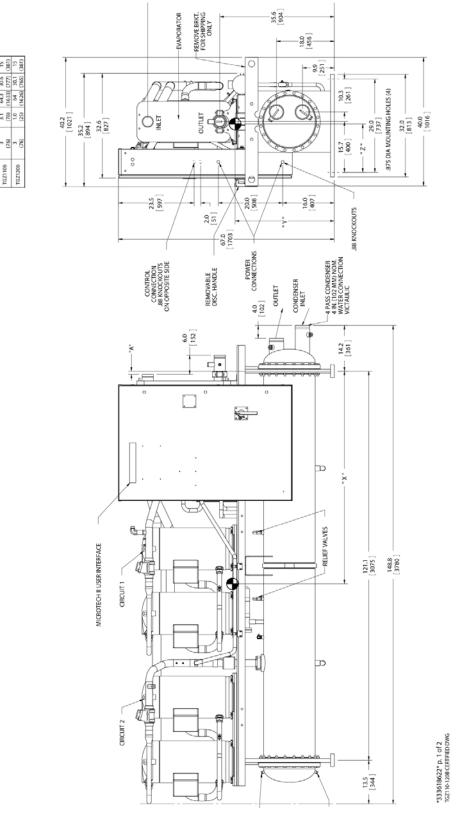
Dimensions, TGZ080B – TGZ100B, Standard 4-Pass Condenser
